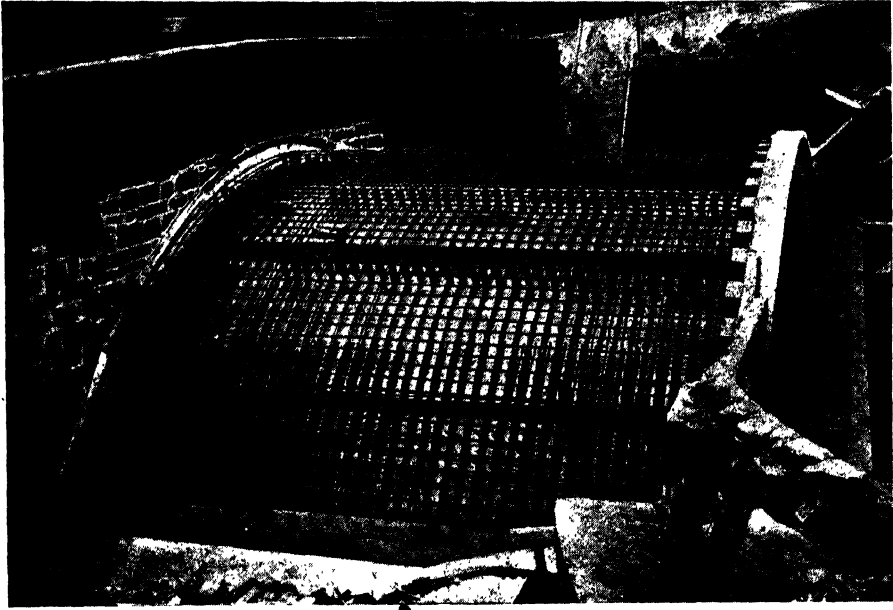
REINFORCEMENT AND VOUSSOIRS IN POSITION.
